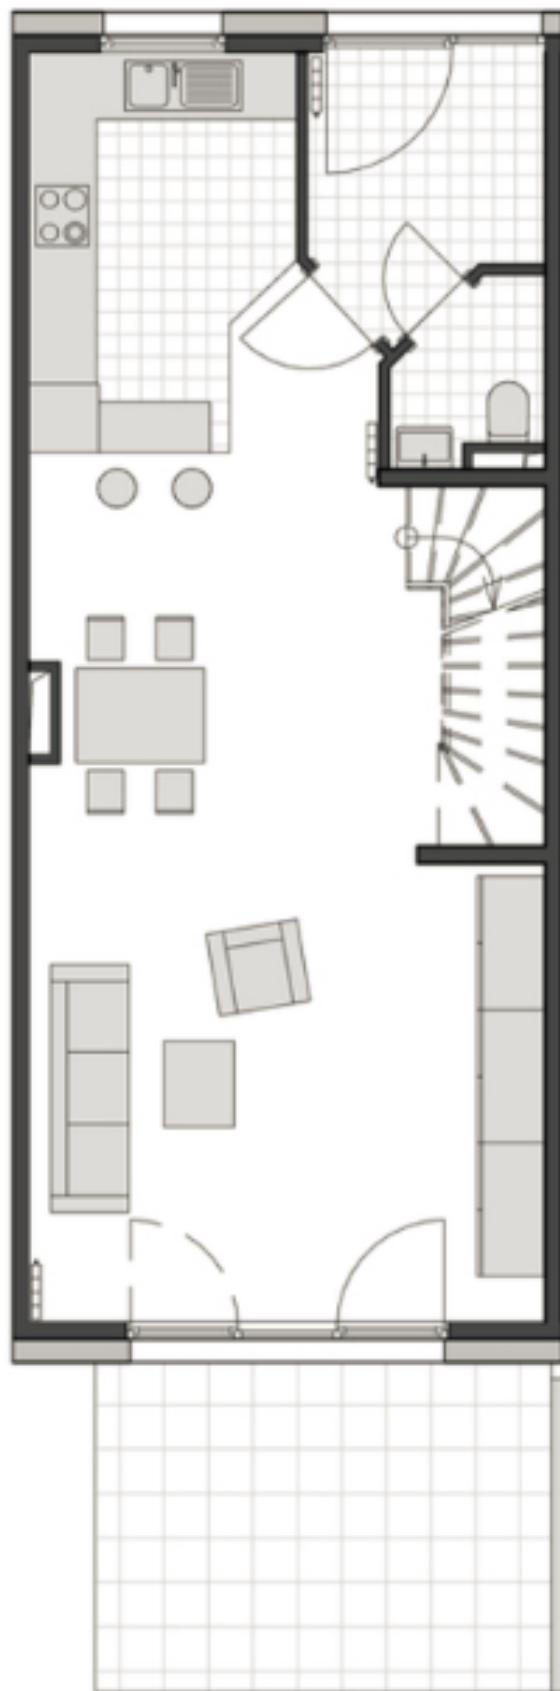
Terraced house, building location: Freiburg, Type RH 136 SD35, earthquake zone 1-3 [12]
